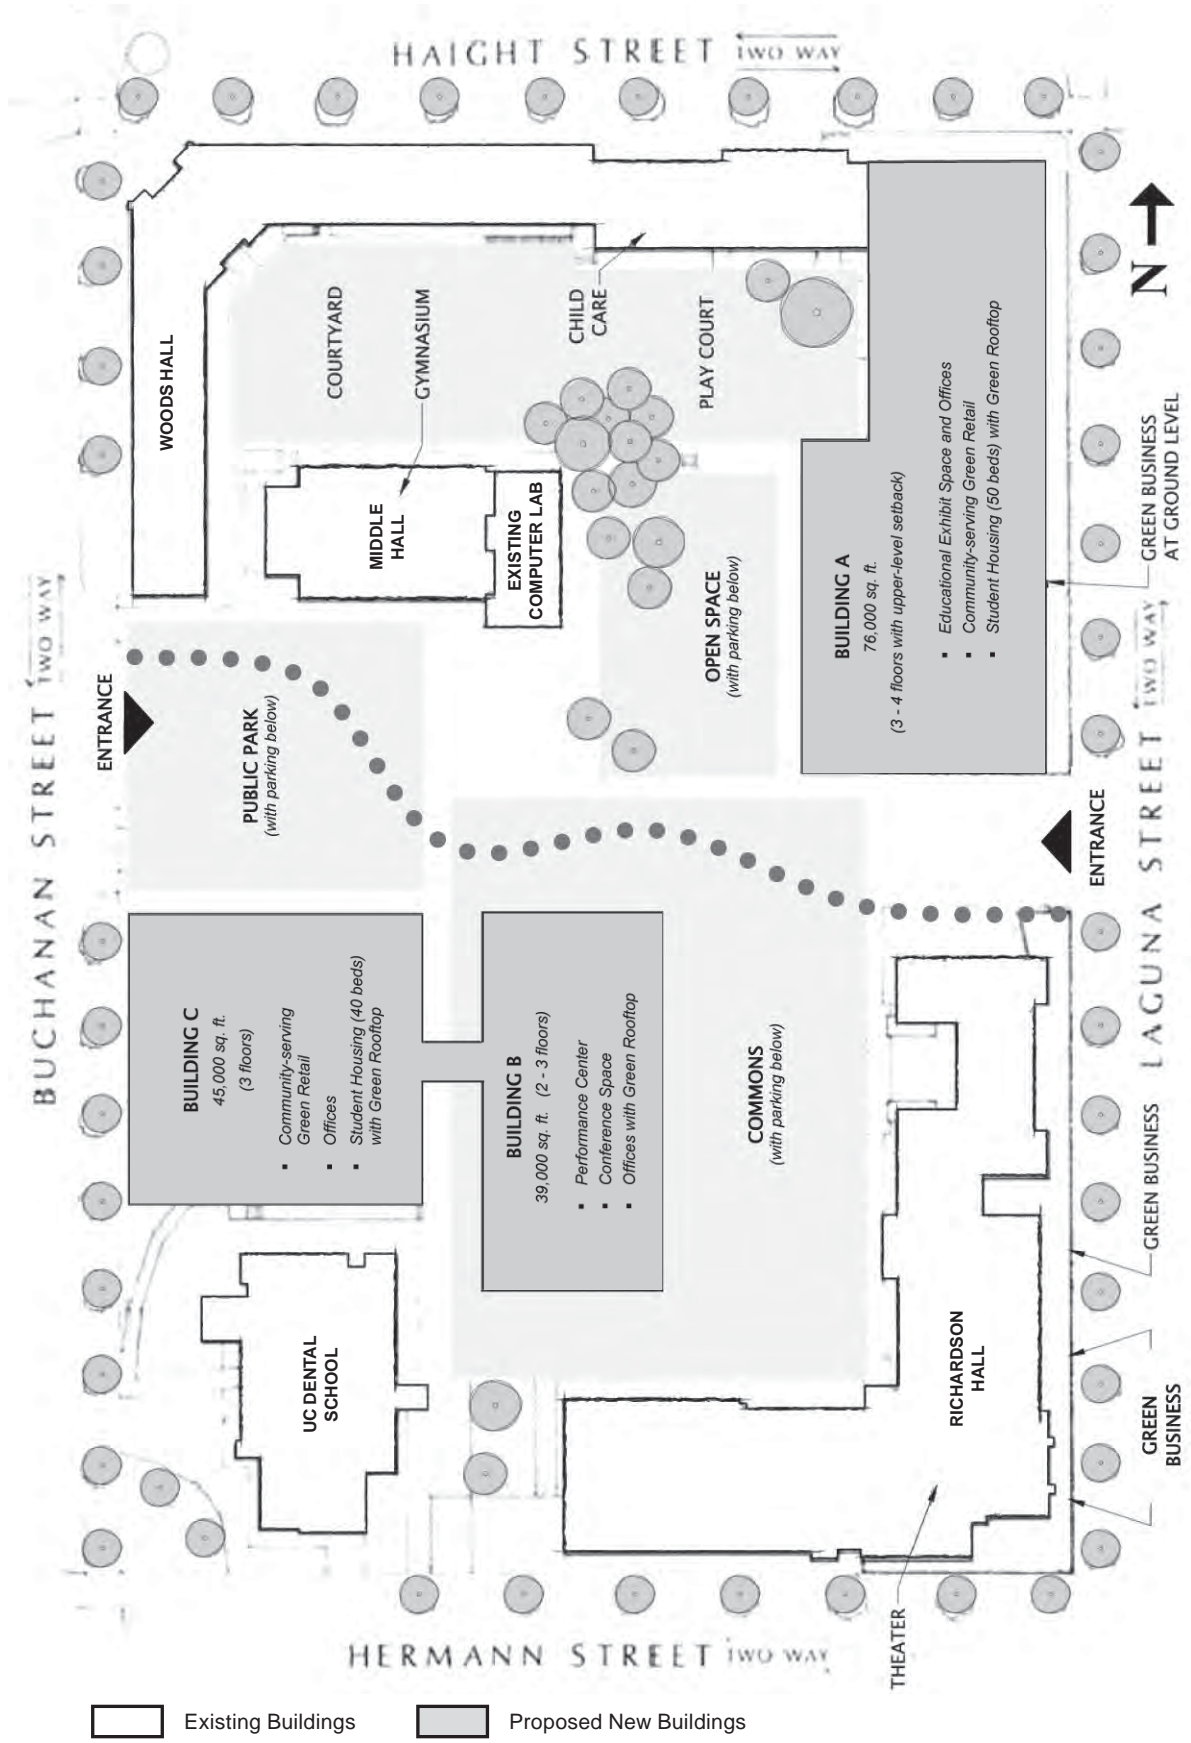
Alternative C: New College of California and Global Citizen Center Concept Plan
